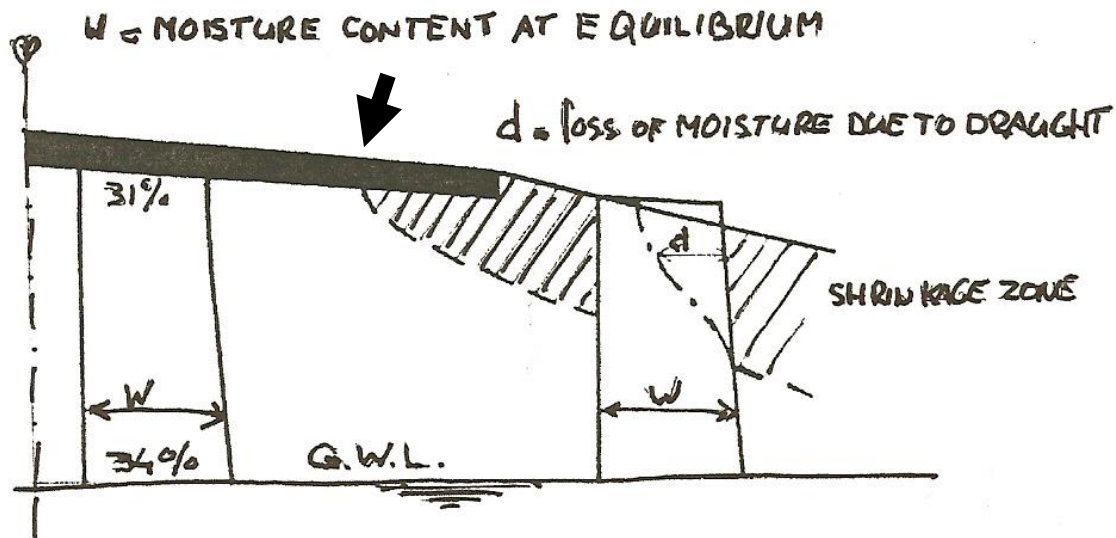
Due to an extended dry period, the subgrade under the pavement edge started to shrink resulting in significant cracking at location of the arrow.
